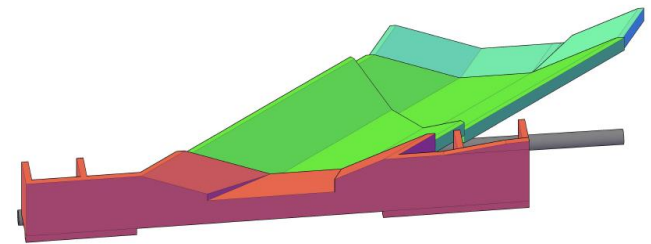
3D model of the concrete channel of the hydraulic catchment 6.
